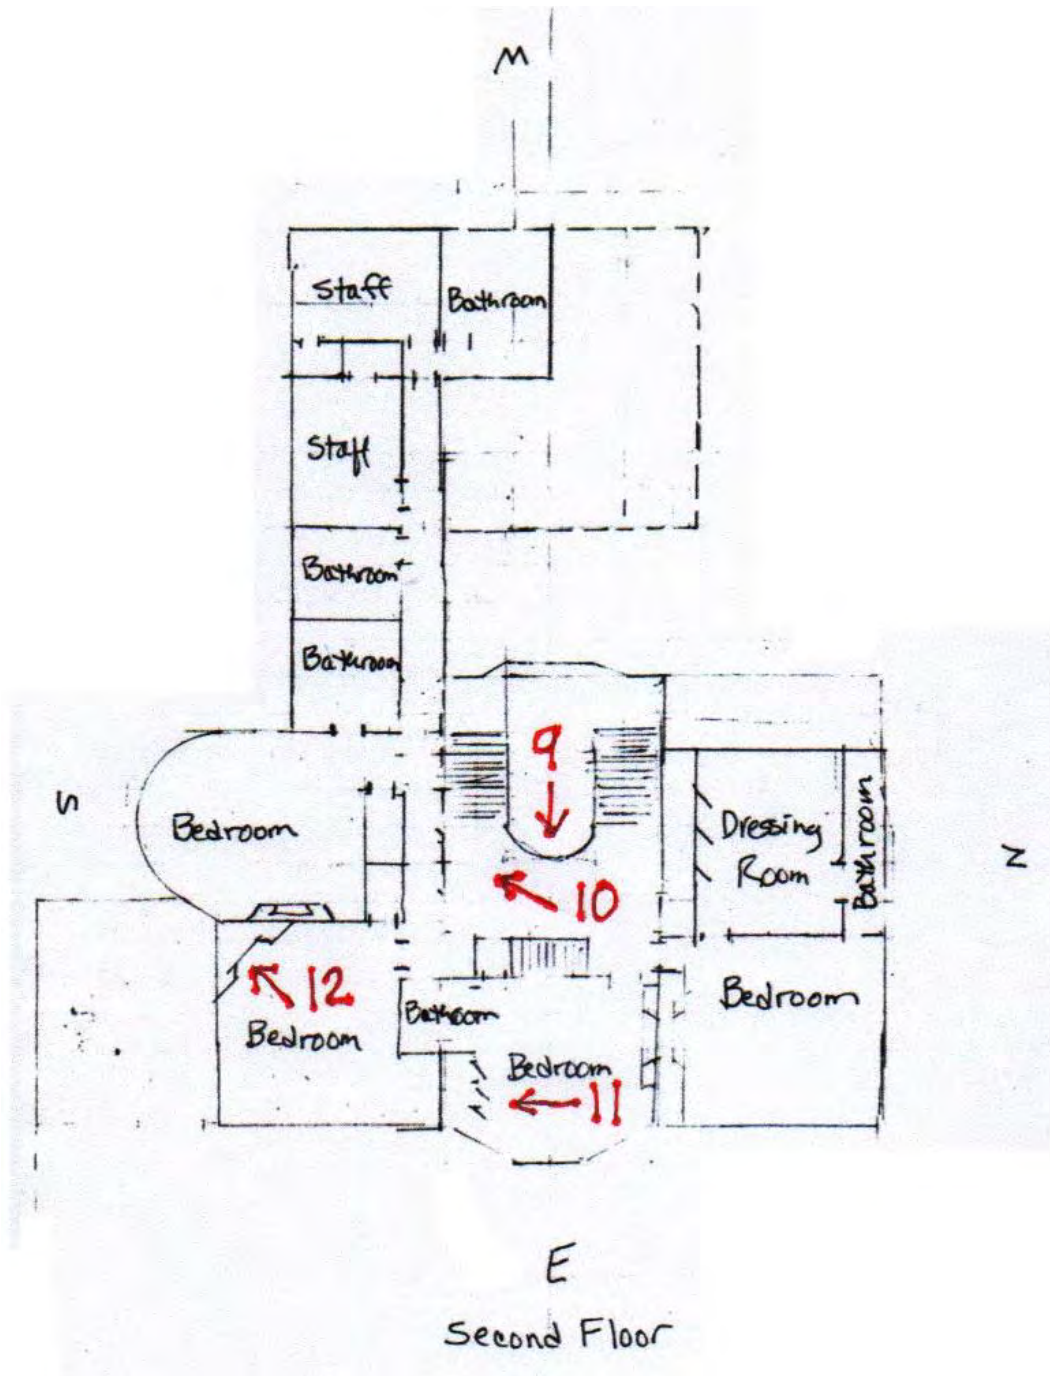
Second-Floor Sketch Plan and Photo Key (in red) of the H.R. Reed House. Present plan drawn by Judith Rosbe.
